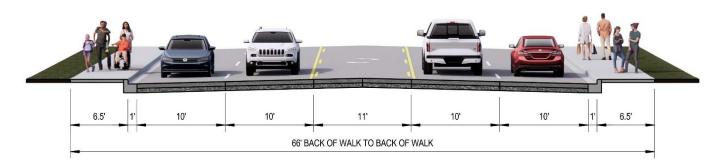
Pavement Replacement as a Narrow 5-Lane Facility with Monolithic Sidewalk (Bonanza Drive to Pilgrim Drive), facing north
